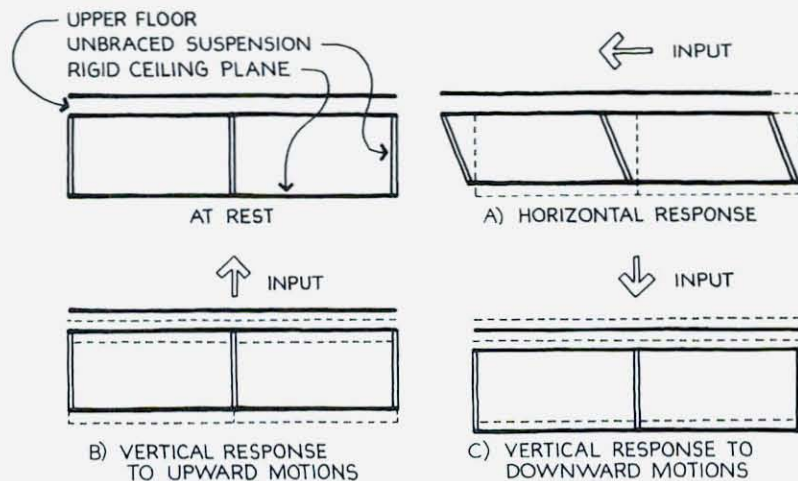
CEILING TYPE: RIGID CEILING PLANE - UNBRACED SUSPENSION.
